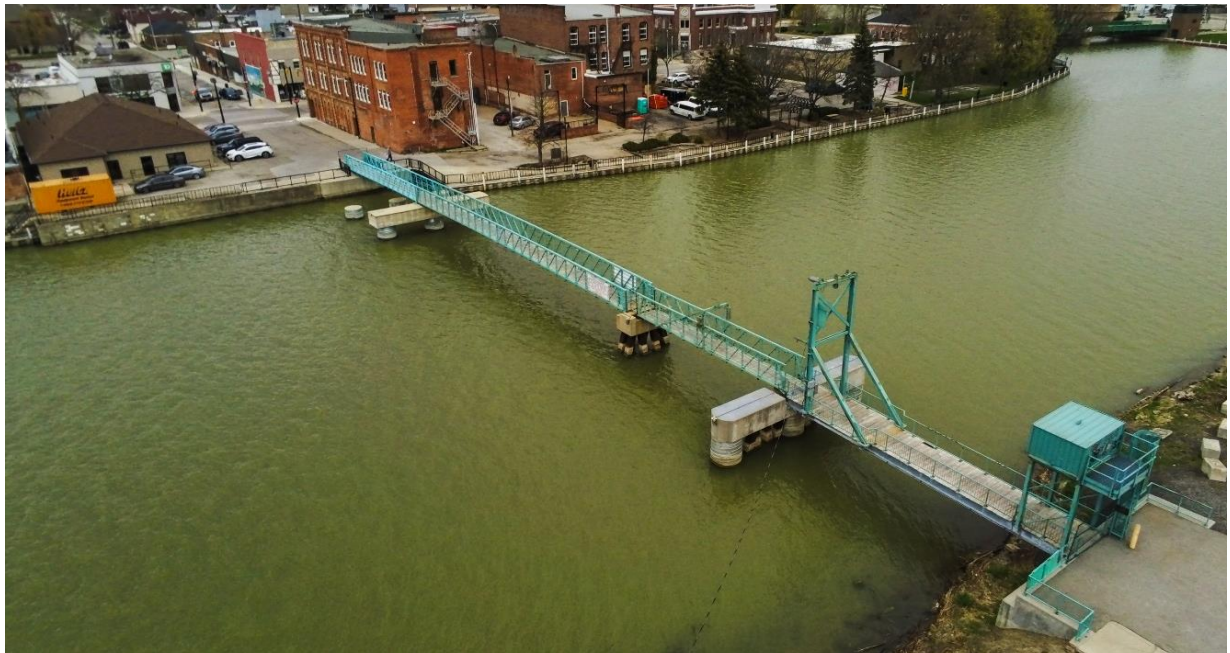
Photo of the LO Stonehouse Memorial Walkbridge over the Sydenham River
